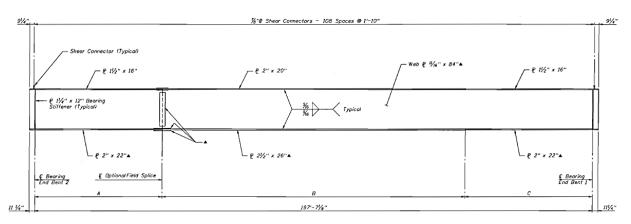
Typical details of girders of the SR-589 Bridge over Hillsborough Avenue
